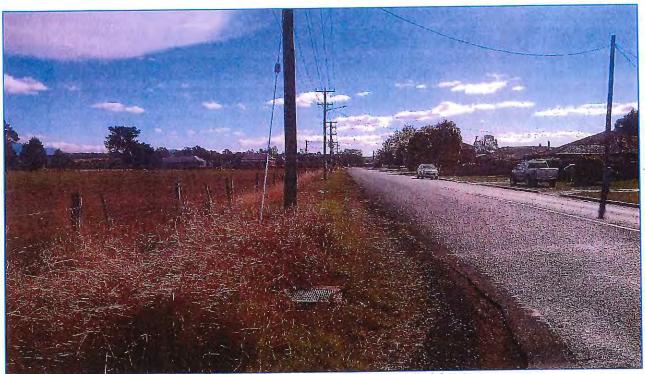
Looking west along Bulwer Street from the Catherine Street roundabout.
